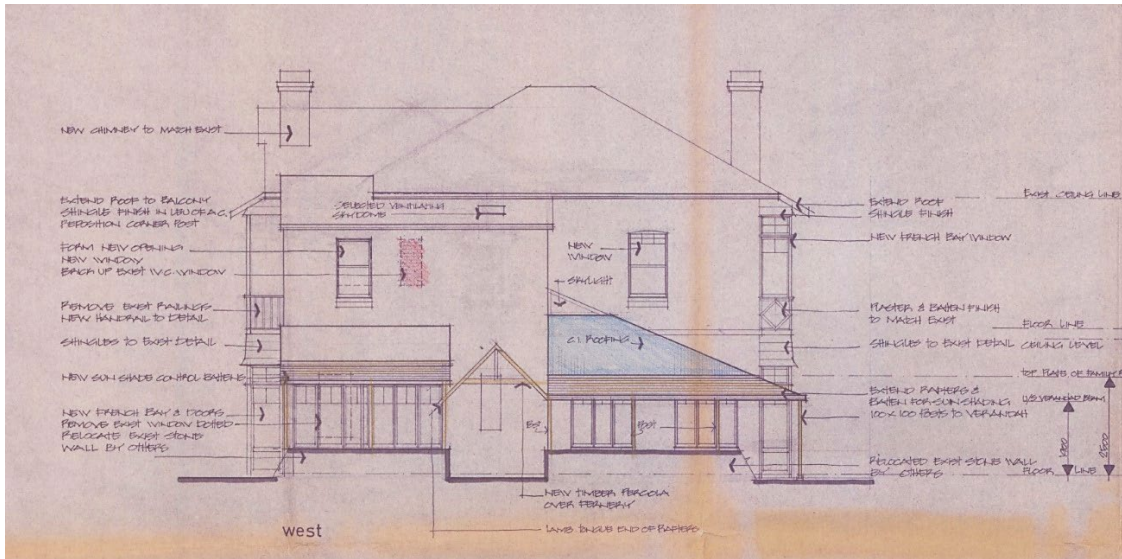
Approved plans 1983 plans for alterations and additions showing new French bay window at the western elevation.
